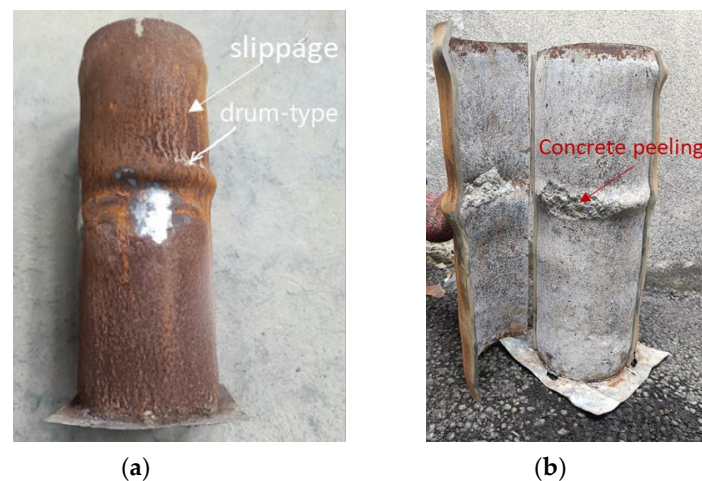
Failure modes of the GCFST-10 specimen under axial compression: (a) surface damage; (b) fracture inside the specimen.
